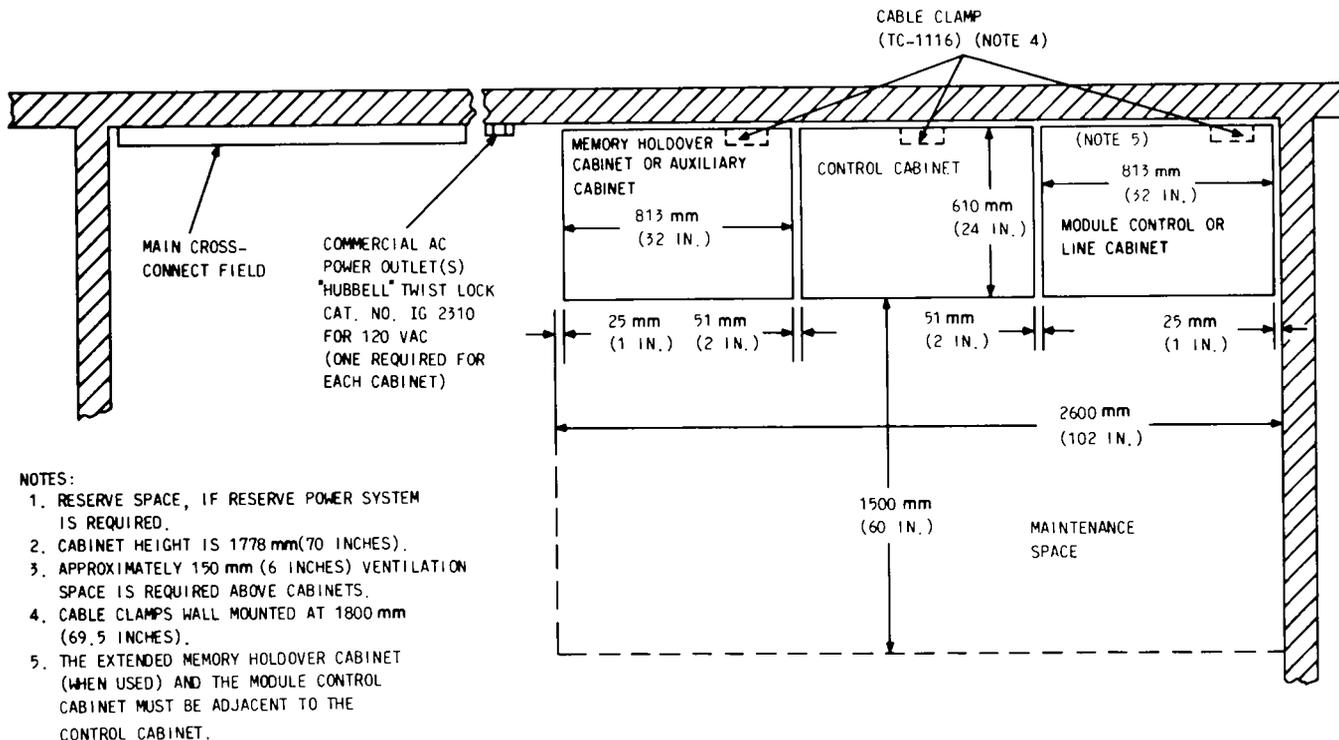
DIMENSION 600 PBX—Minimum Floor Space Requirements—2-Cabinet System
